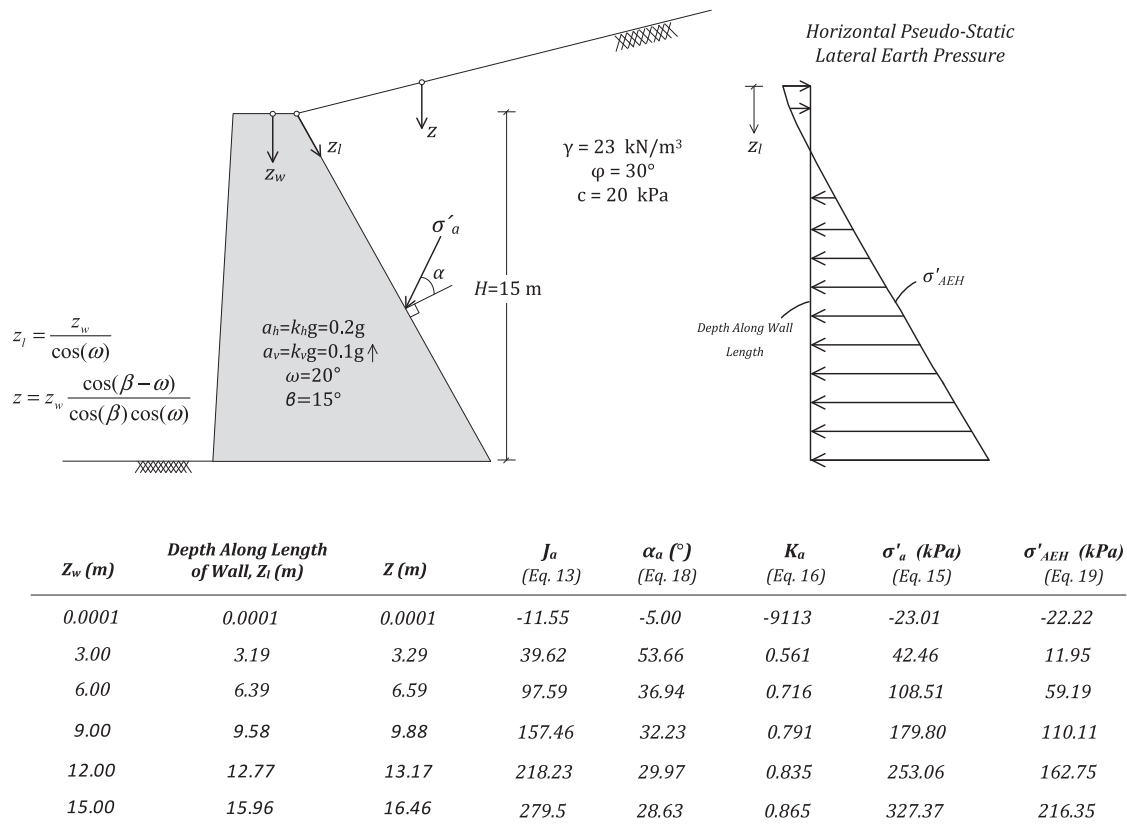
Illustrative example of inclined wall retaining sloped c - φ backfill.
